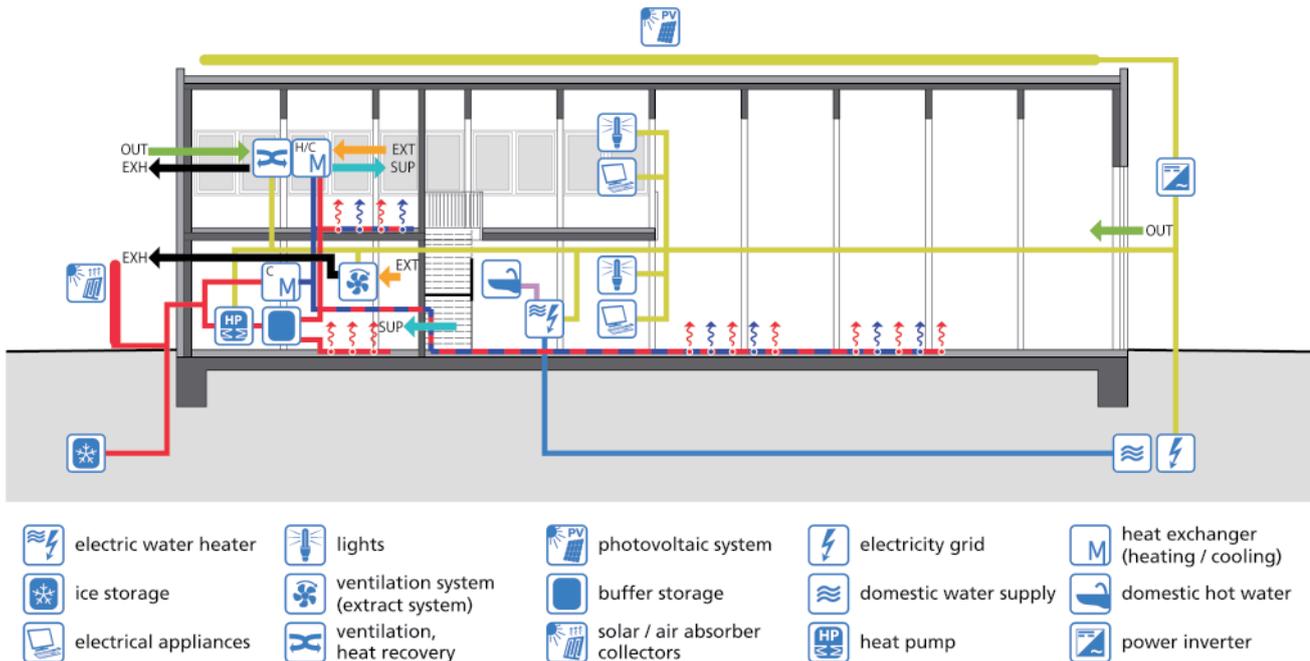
Longitudinal cross-section through the research hall and design of the building services
